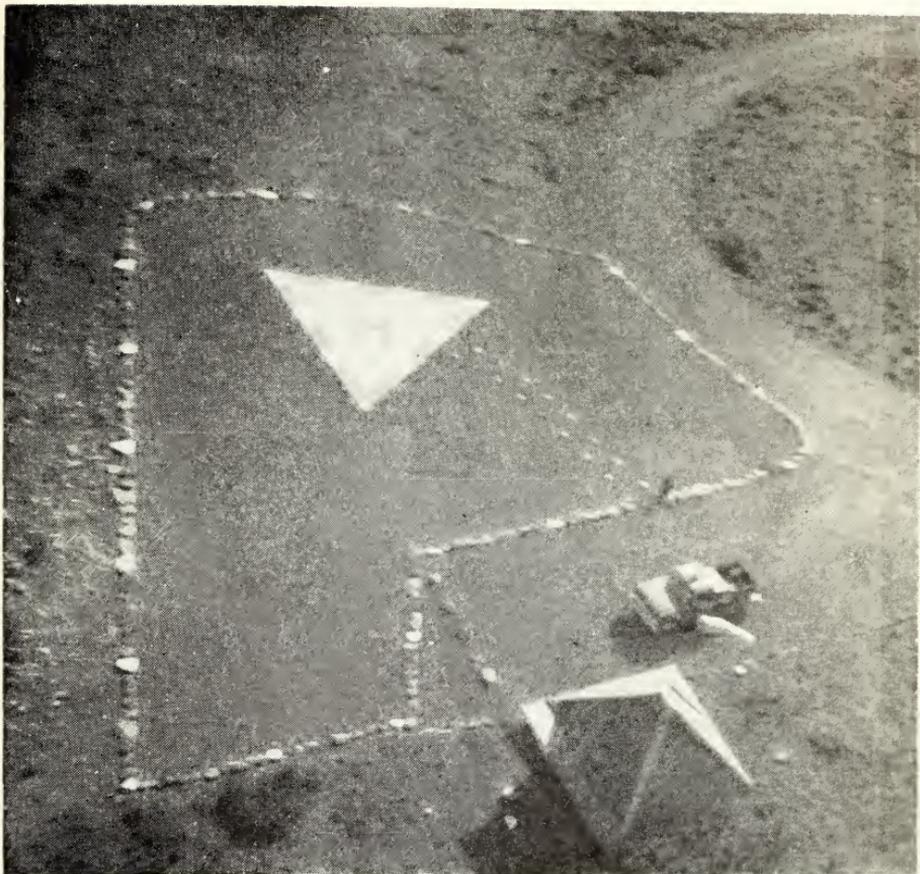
Heliport (from overhead looking south), showing storage shed, parking area, and layout detail.
